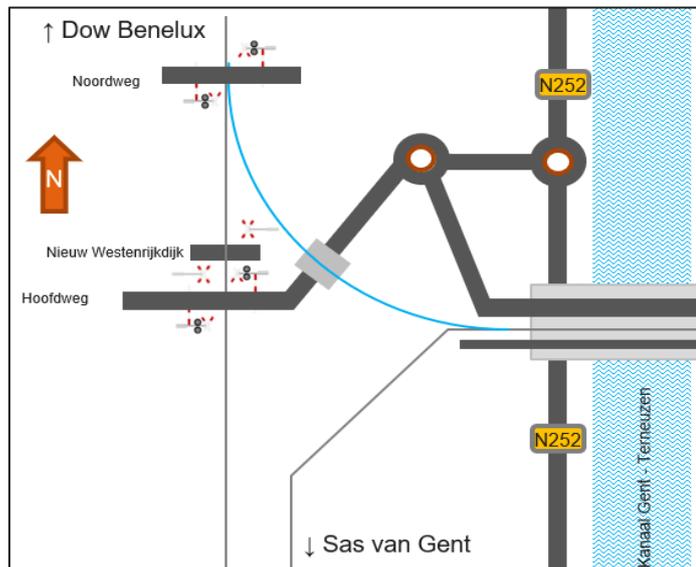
Infra-element B2: Infrastructural-element: North-East connection towards the 'Sluiskil'-bridge
